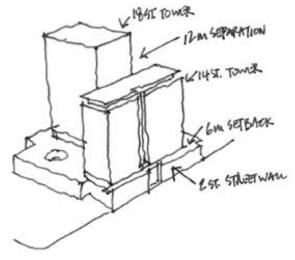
Staggered tower heights (Source: Joint Panel Report Bankstown Master Plan Site Specific Review, March 2022)
